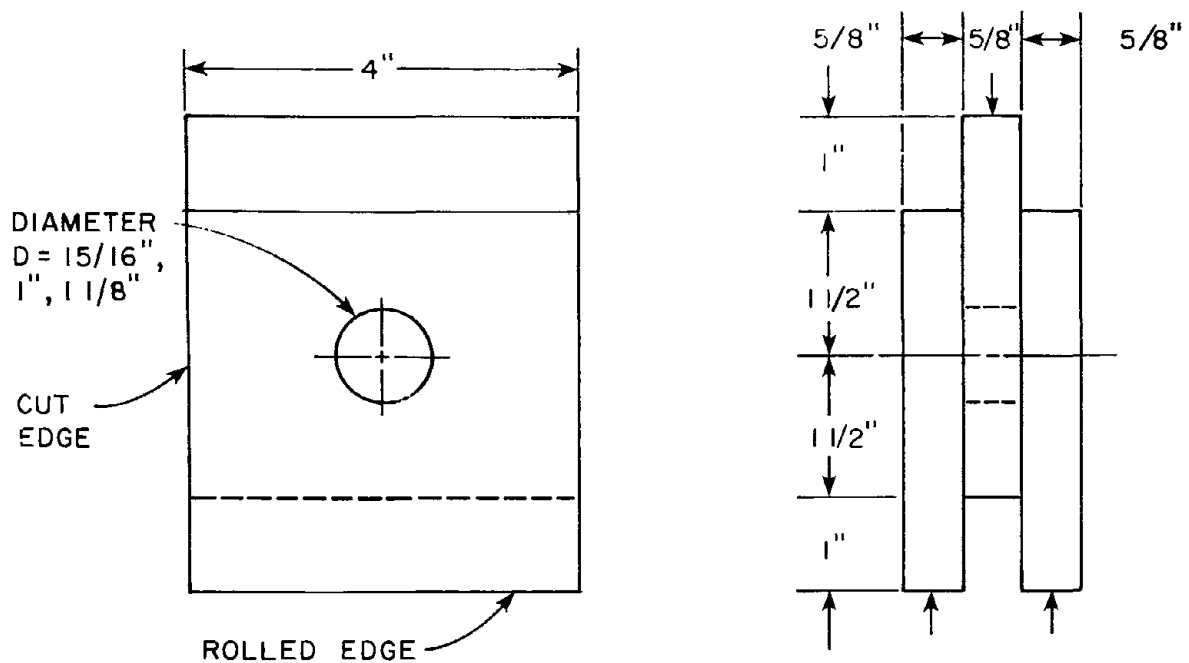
Slip test specimen (1 in. = 25.4 mm)
